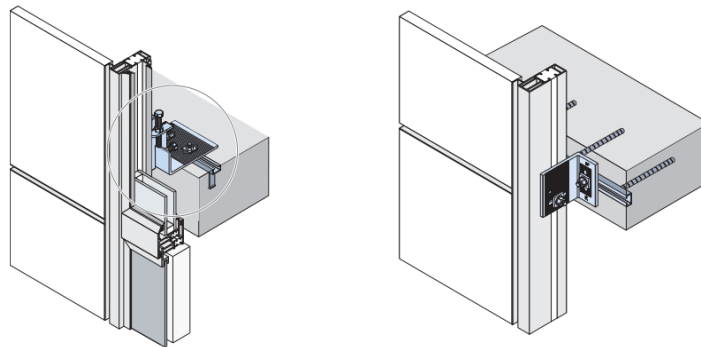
HALFEN curtain wall support systems. Figure adapted from [5].
